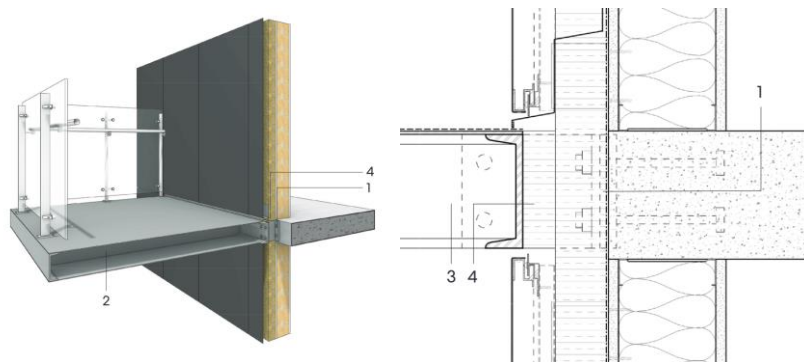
steel balcony (2,3) with thermal insulation (4) and discrete connections (1)
